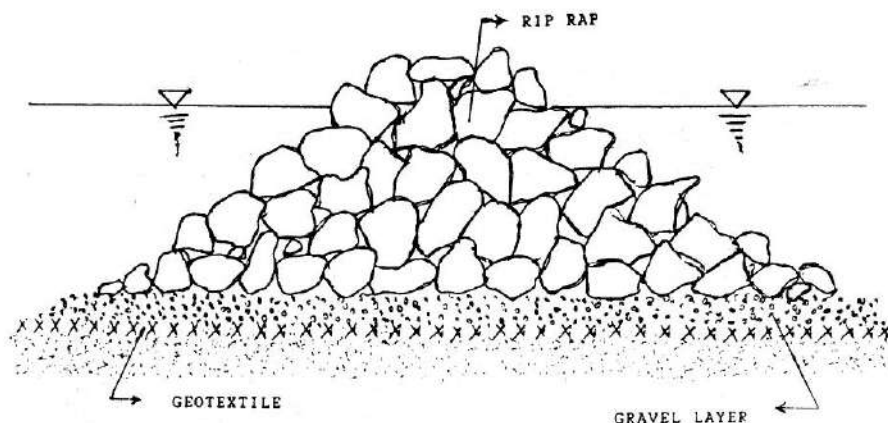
Use of geotextiles for construction of structures on soft sea/river bed
